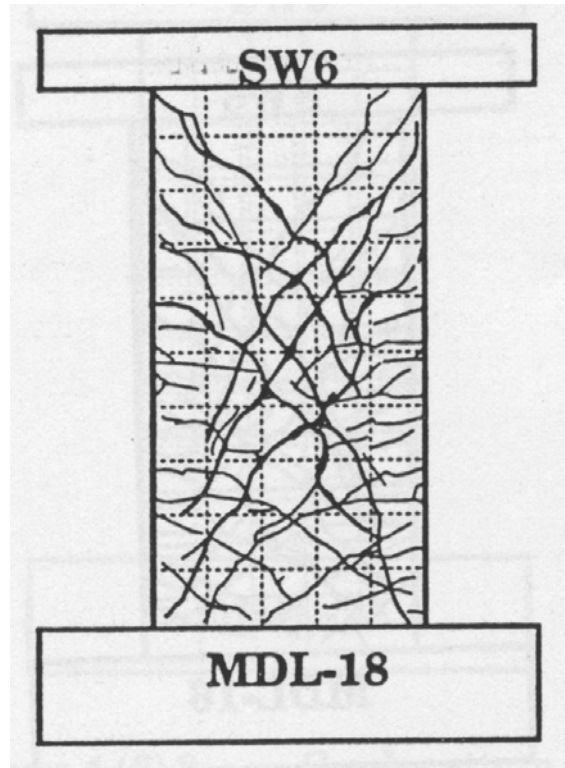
Condition of wall SW6 at 1.50% drift [Pilakoutas (1991)]
